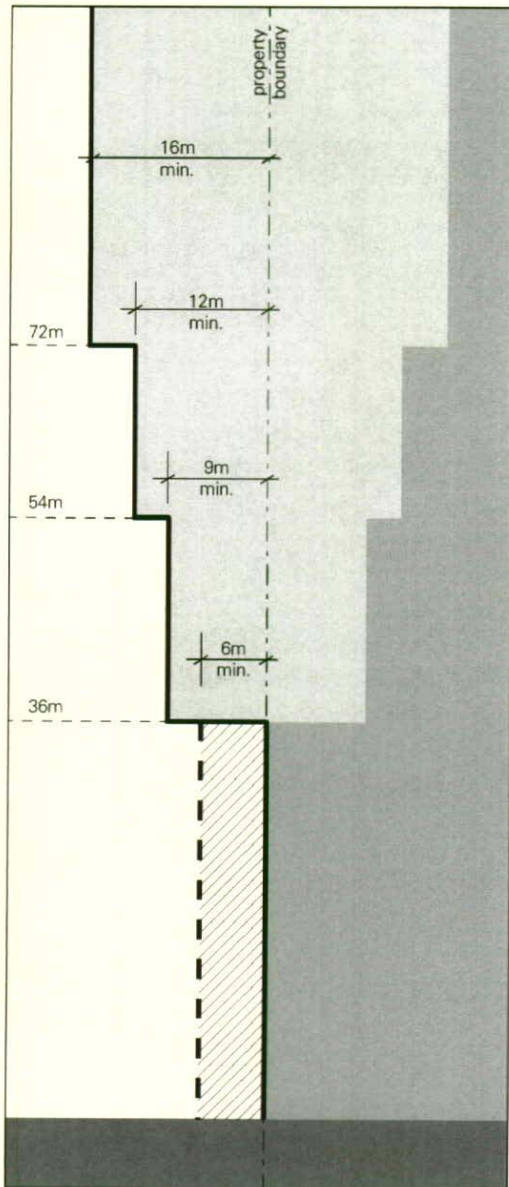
Minimum side and rear building setbacks. Generally the lower levels of buildings are to be built to the boundary at the street frontage OR set back at least 6 metres. Applies to all side and rear boundaries unless identified in Figure 2.1.
